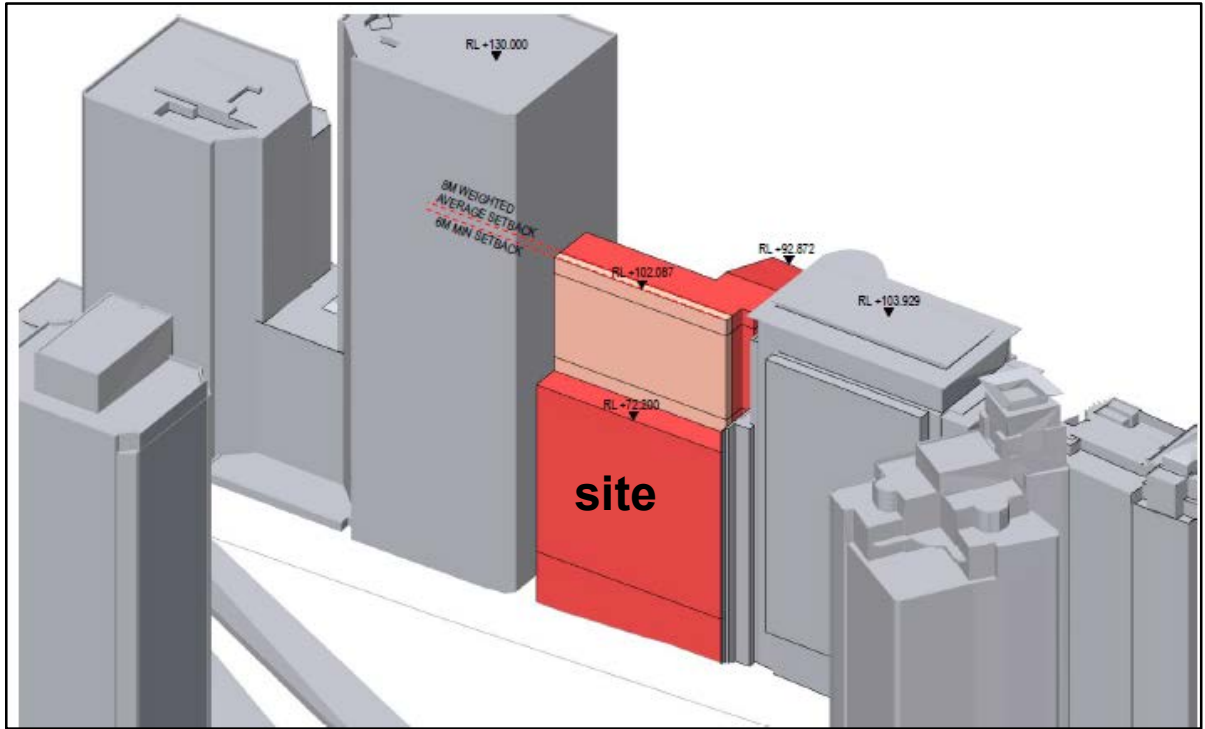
Proposed building envelope as viewed northeast from Kent Street
